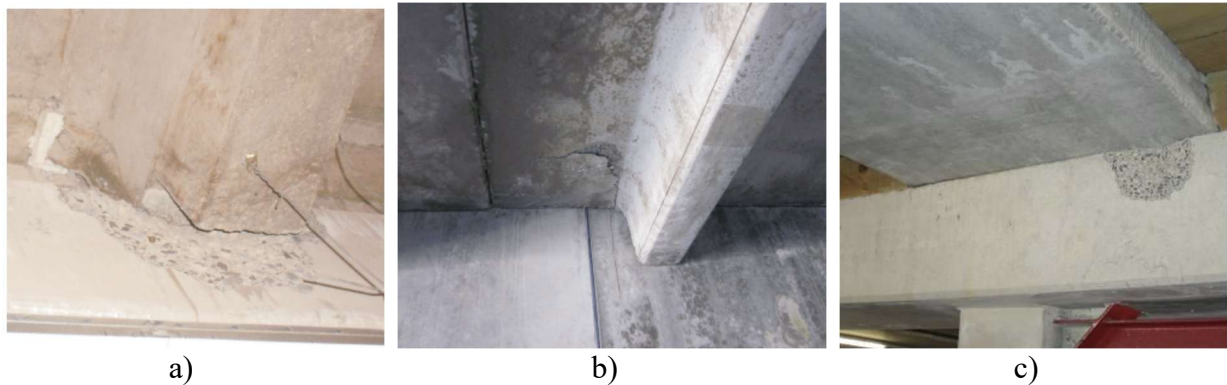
Examples of damage attributed to damage state 2a: a) spalling of primary beam at dapped double tee connection (Corney et al. 2014); b) cracking and spalling of double tee flange (Corney et al. 2014); c) spalling of primary beam from hollow core section above (Kam et al. 2010)
